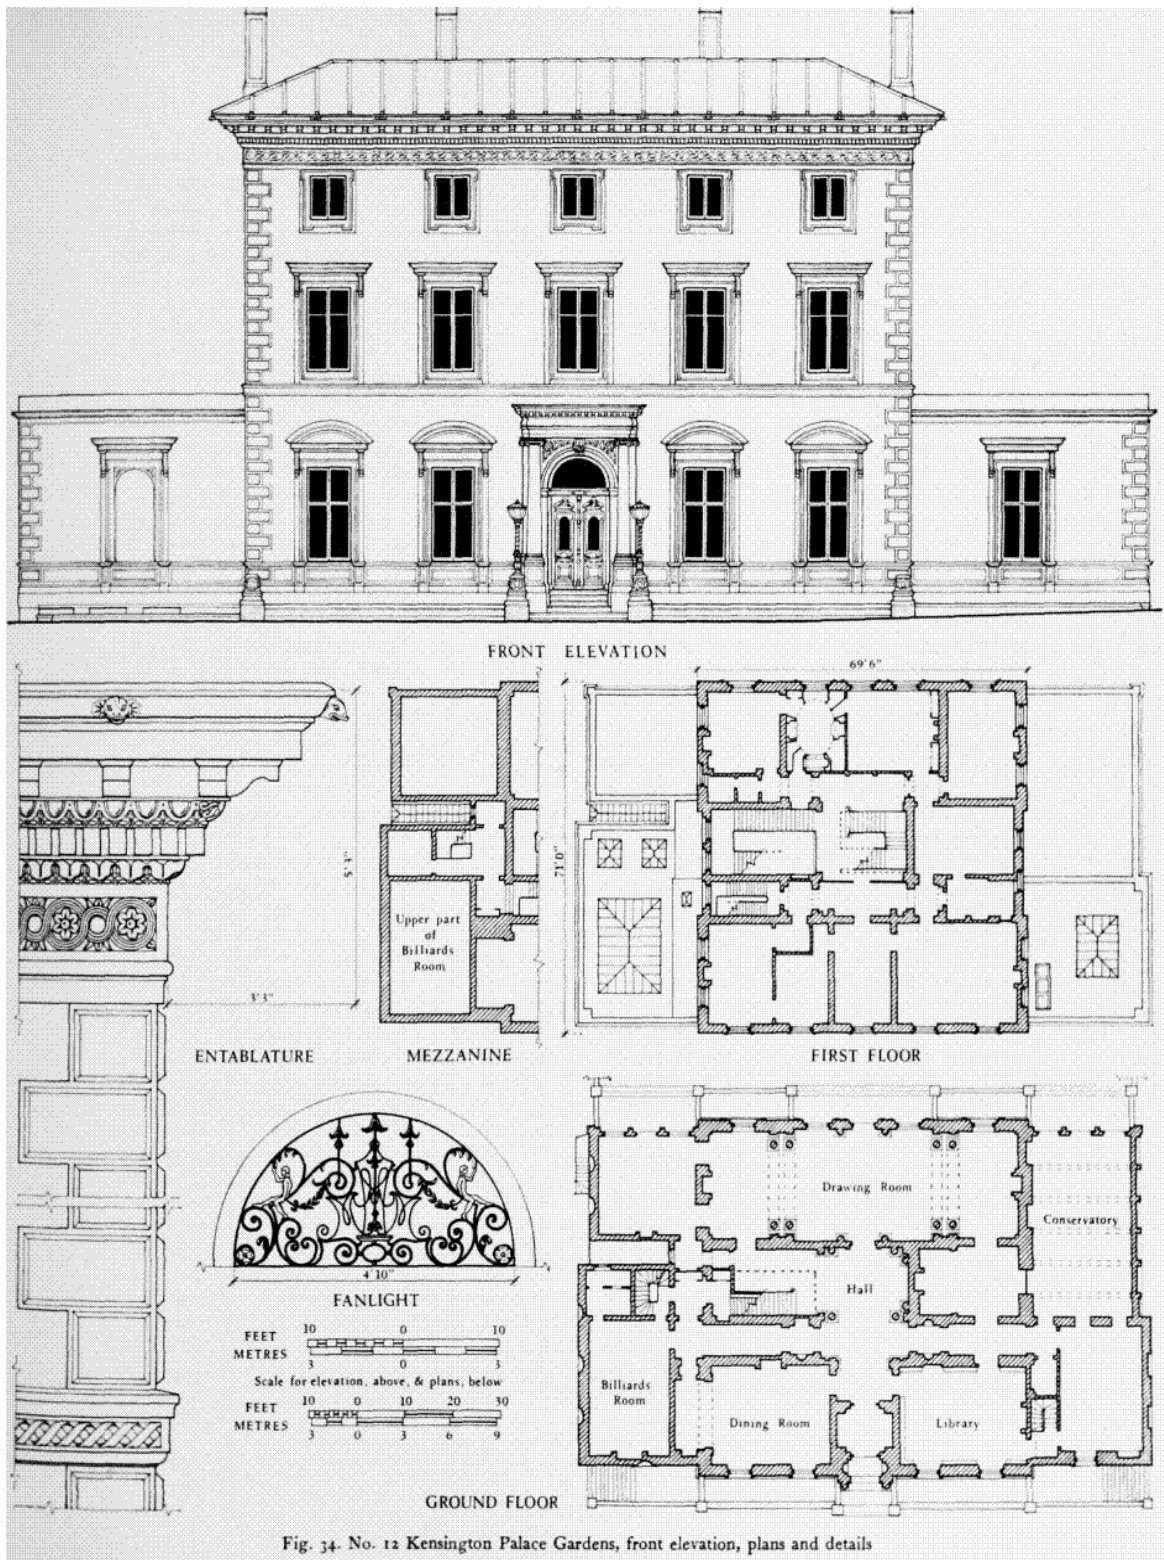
No. 12 Kensington Palace Gardens, front elevation, plans and details
